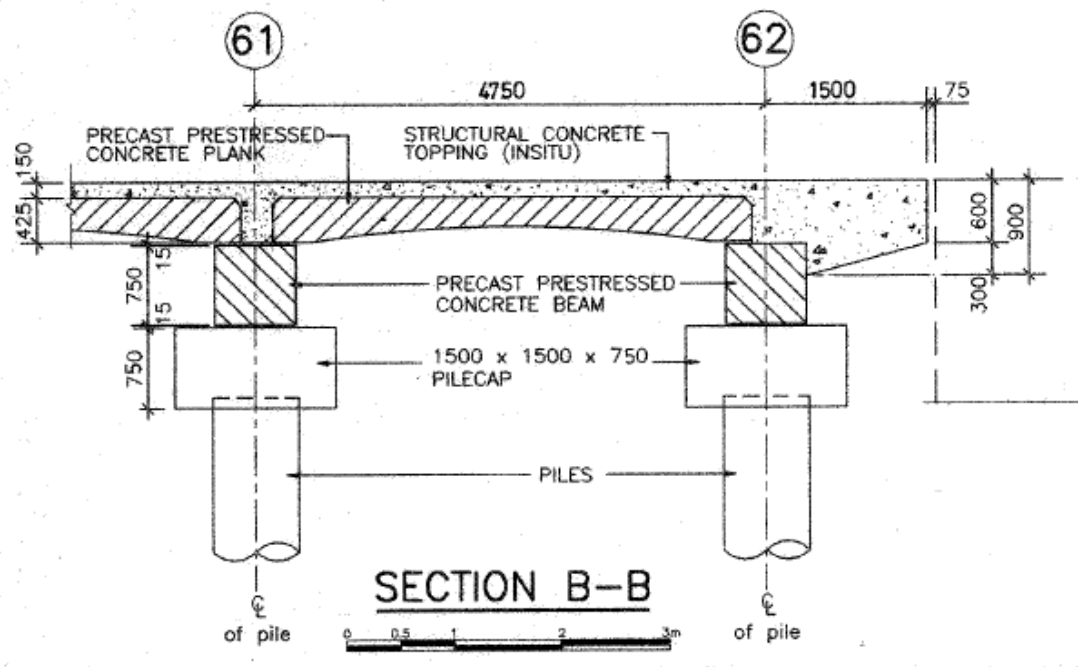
Typical details of Dry Bulk Berths (based on DB1) deck slab and beams.
